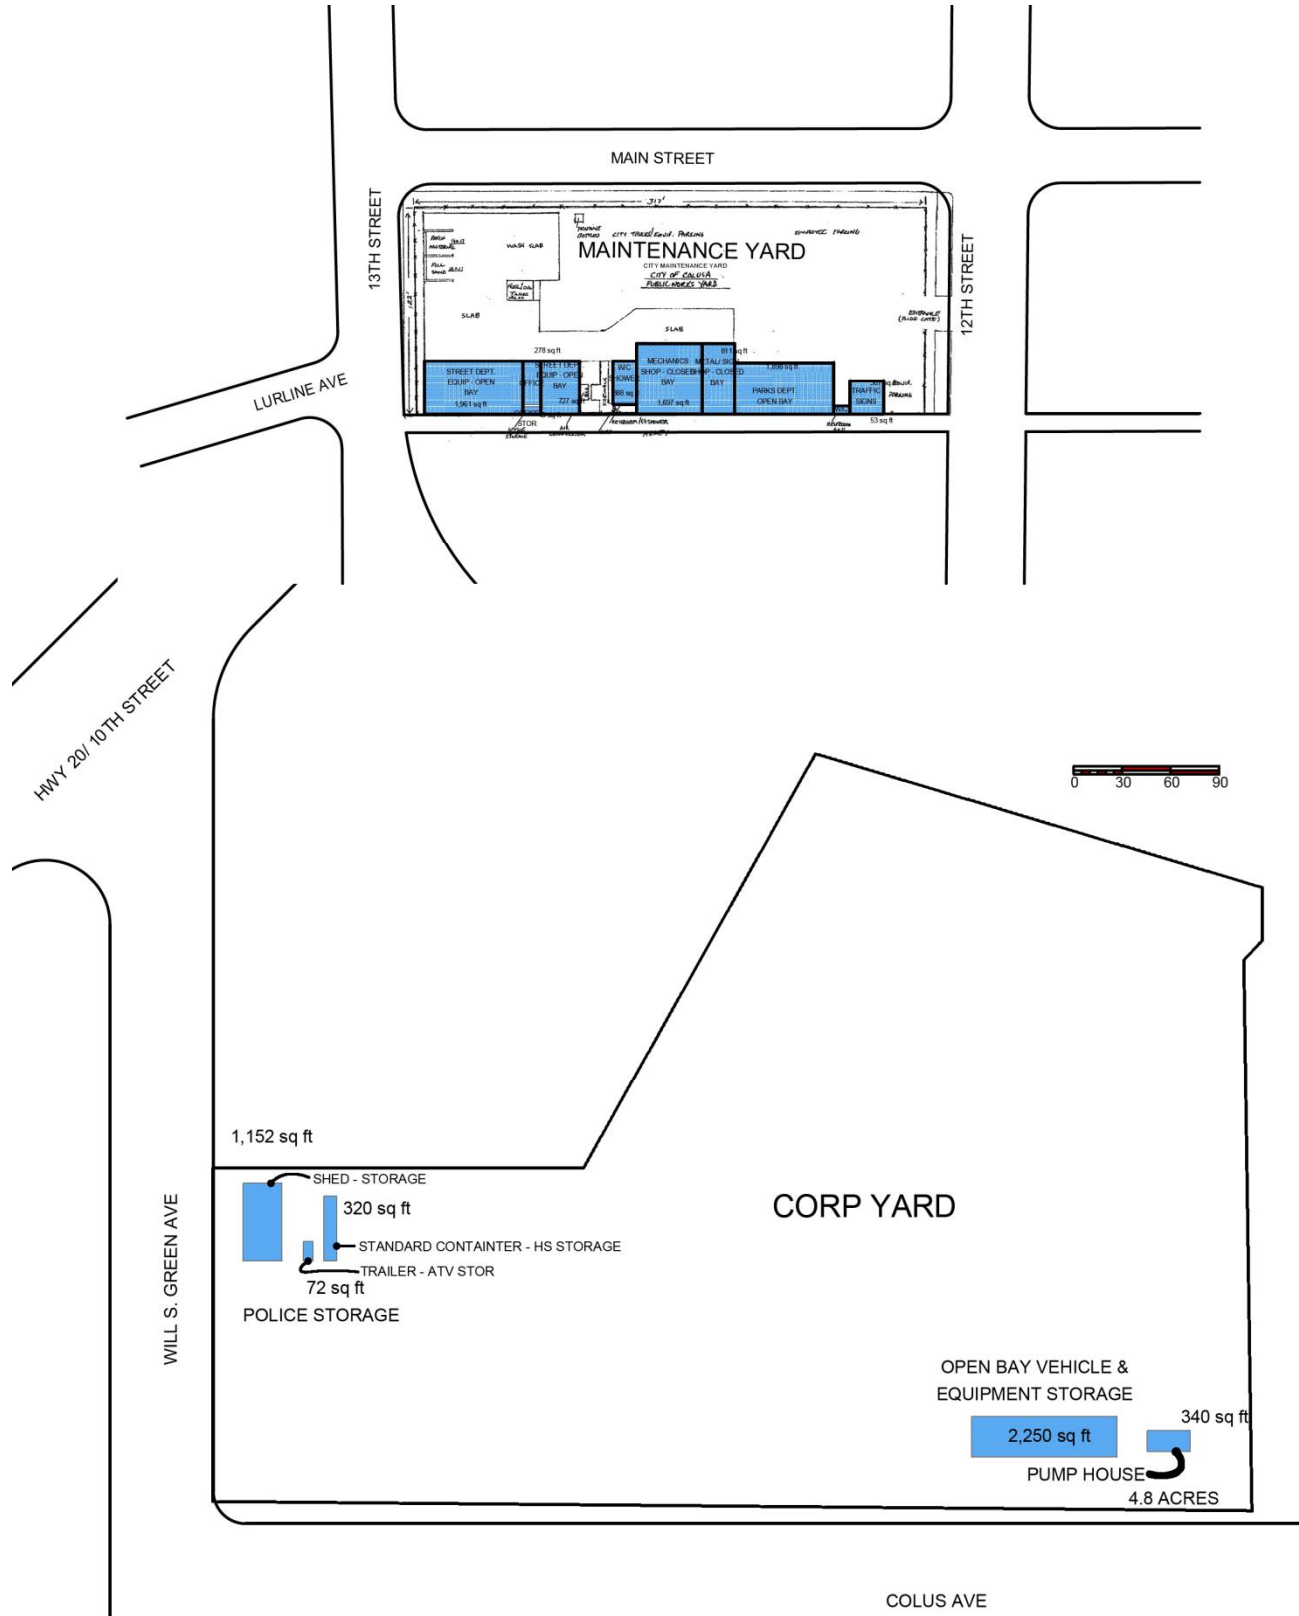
Site Plan of Existing Maintenance Yard and Corporation Yard
